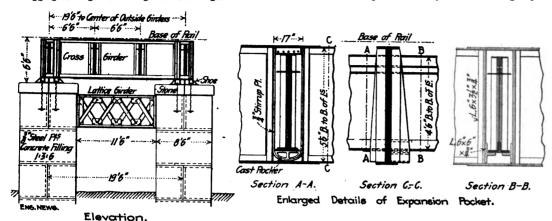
PLATE-GIRDER SPANS FORMING THE SLOUGH CROSSING OF THE NEW CLINTON BRIDGE (WITH DETAILS OF THE EXPANSION BEARINGS).
